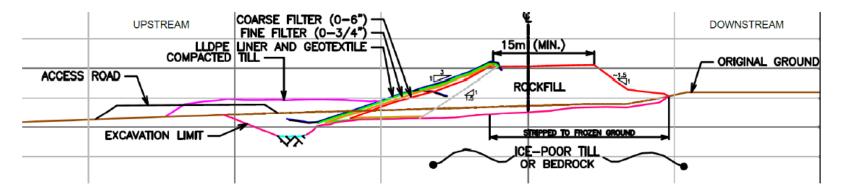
Typical Cross-Section of Saddle Dam 1
